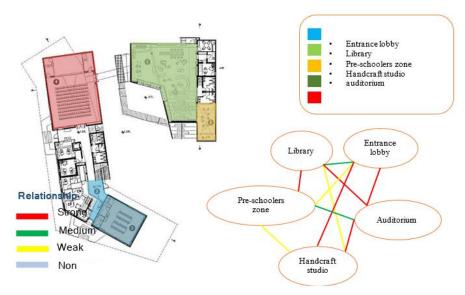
Ground floor plan of Rehovot Community Center, highlighting key spaces.
